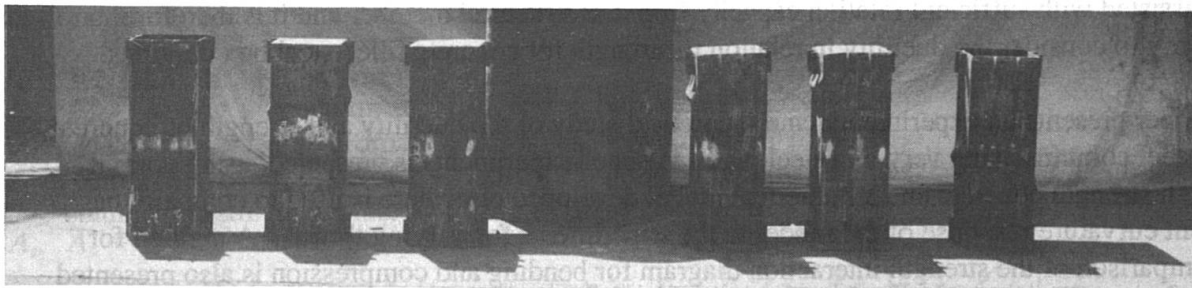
Normal Strength Concrete Test Specimens after Failure
